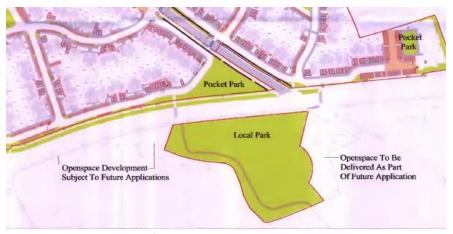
Extract from SD15A/0127 Landscape Plan showing open space north of subject site
